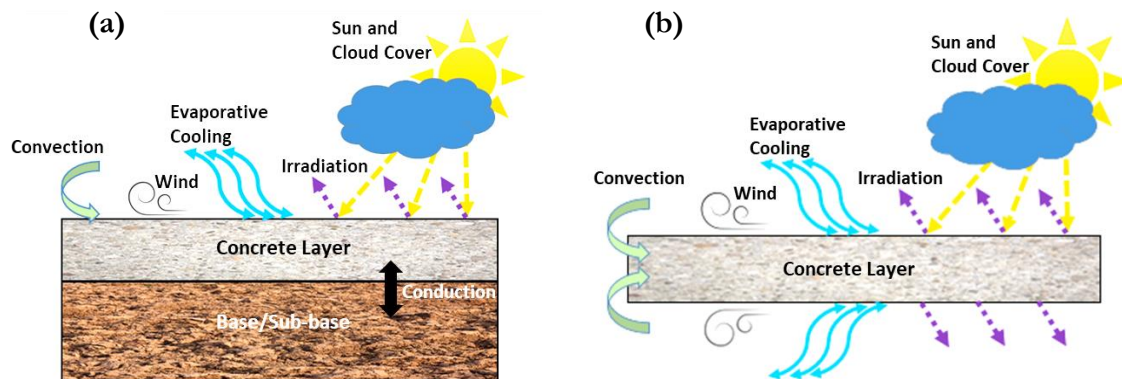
Schematic model of (a) concrete pavement and (b) concrete bridge deck subjected to climatic factors
